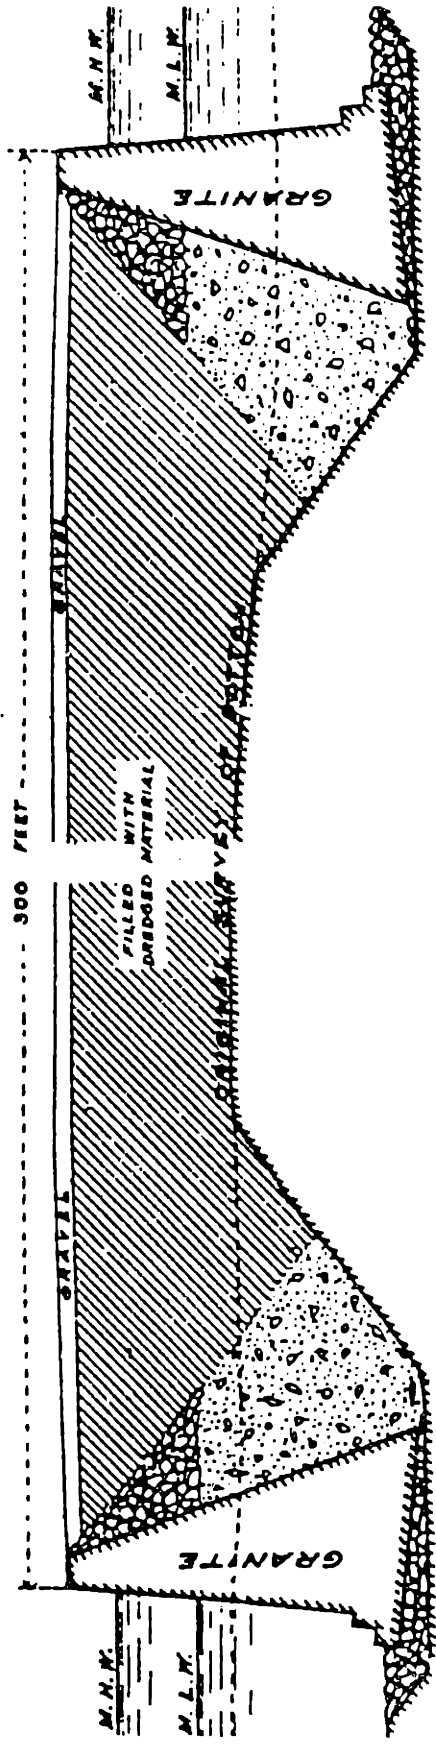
Typical Cross-section of Pier 6 (Harbor and Land Commissioners, 1910)
